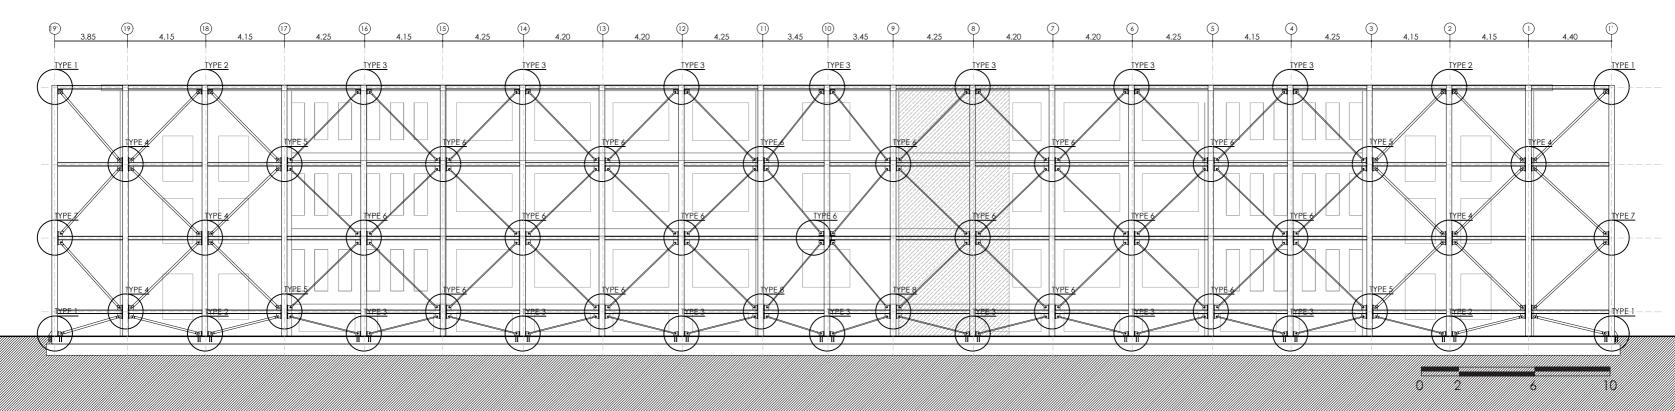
North Facade Construction Details Navigator Typology of connections | Scale 1:200
